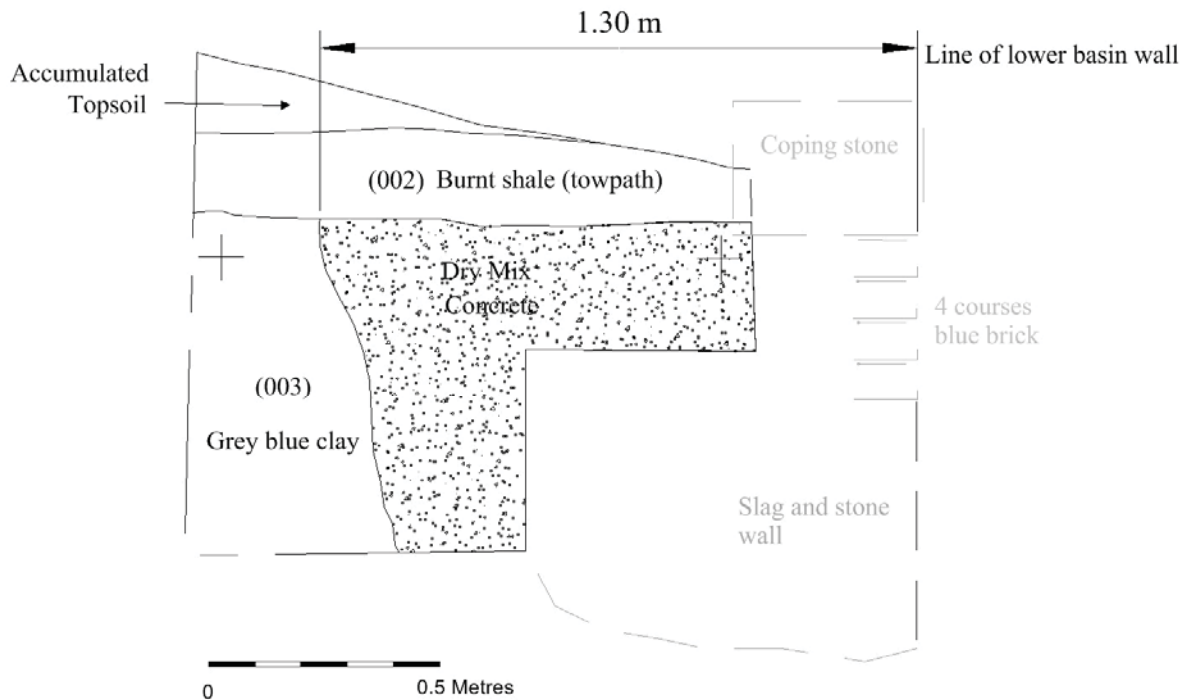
North West Facing Section of Test Pit 1 (in black observed, in grey postulated).
